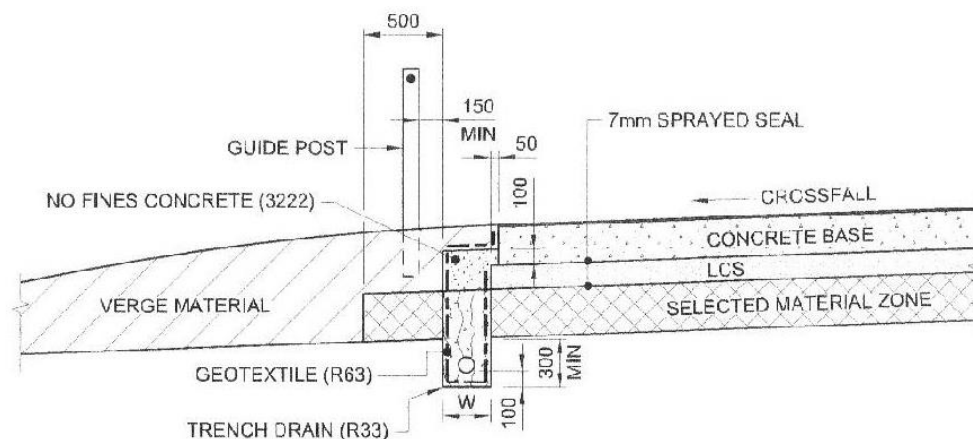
Example of combined subbase/base edge drain and subsoil drain. Perforated subsoil pipe in trench filled with no-fines concrete and trench 'wrapped' in geofabric
